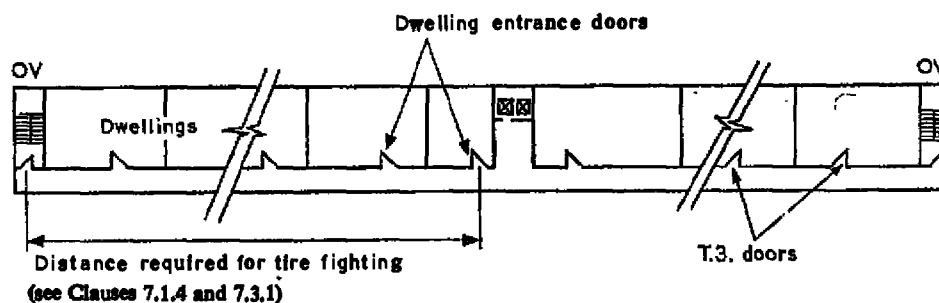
Balcony access flats and maisonettes: two stairways (common access level)
